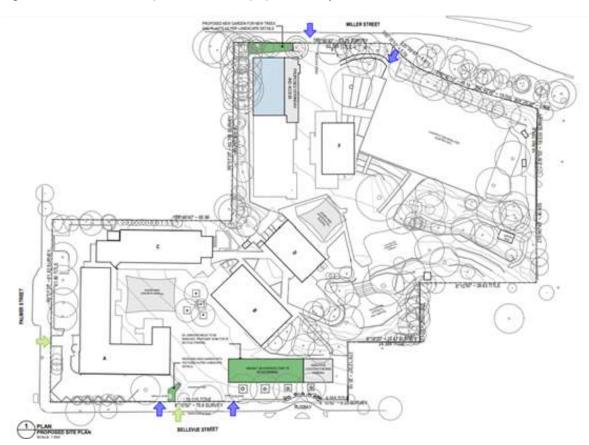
Proposed Scope of Works (Source: Fulton Trotter Architects, Proposed Site Plan Rev 6)
